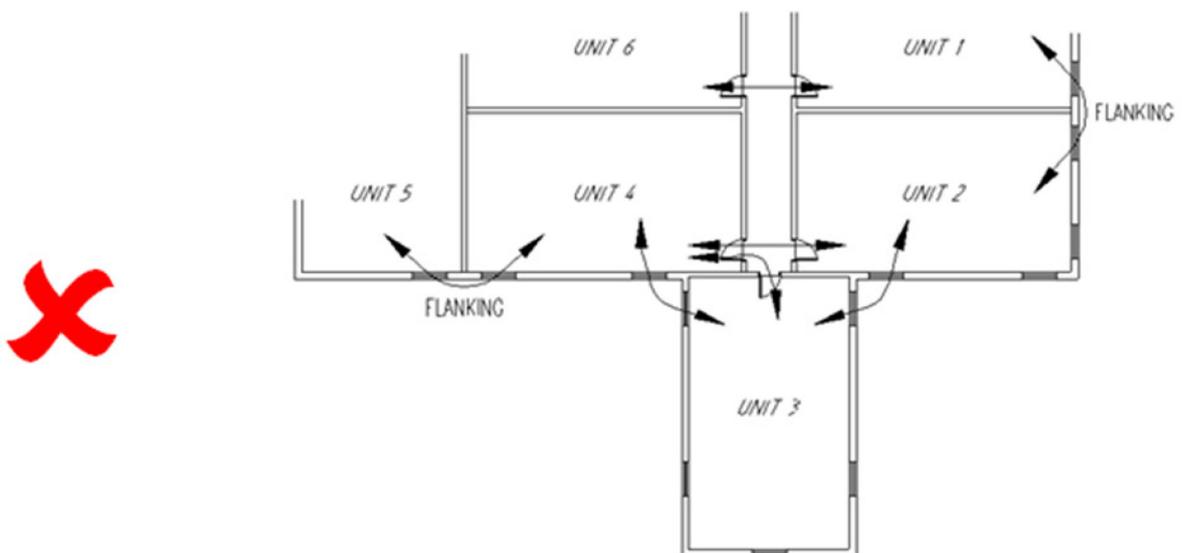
Example of layout planning - Bad acoustic practice to minimise flanking via external glazing and entrance doors, by not ensuring maximum distance between windows and doors.
